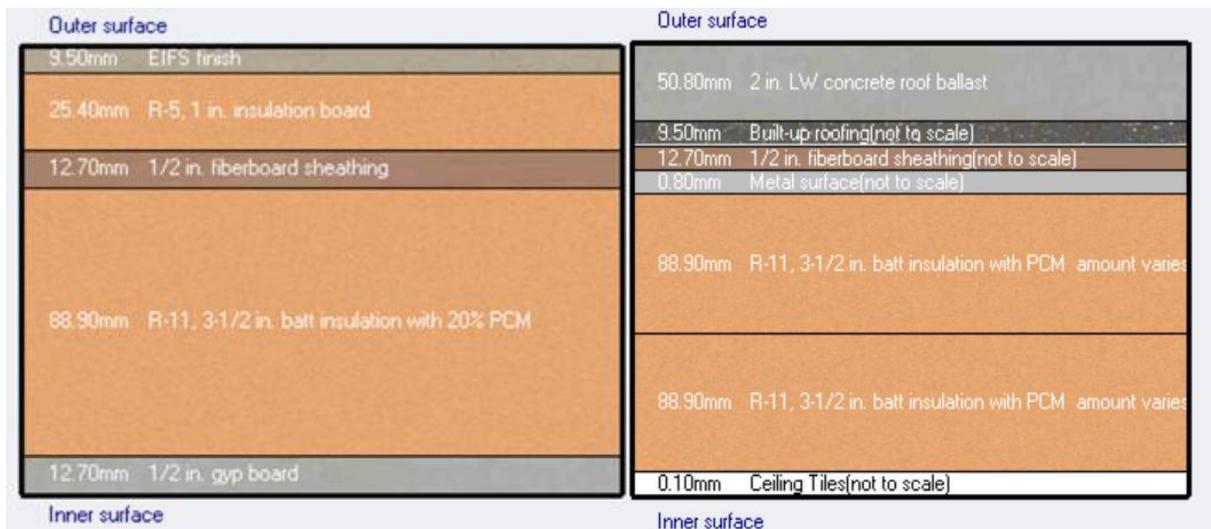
WALL (LEFT) AND ROOF (RIGHT) SECTIONS FOR BUILDING MODEL INCORPORATING PCM IN WALL INSULATION.
